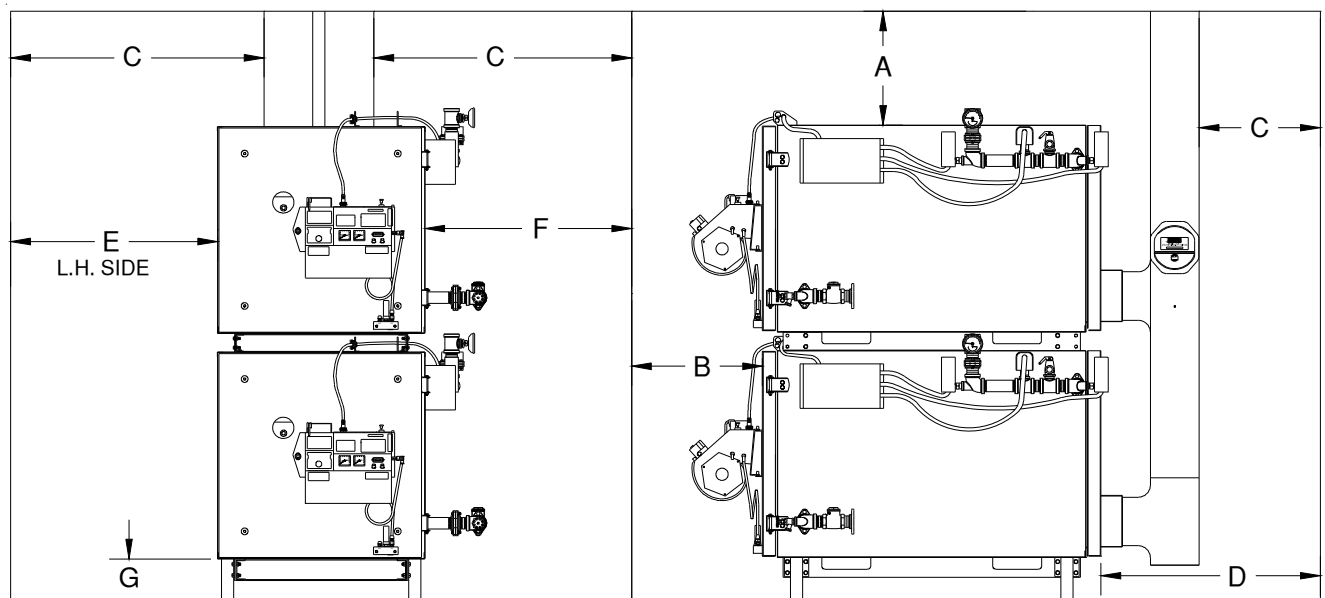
B - Dual-Stacked Boilers Minimum Installation Clearances
